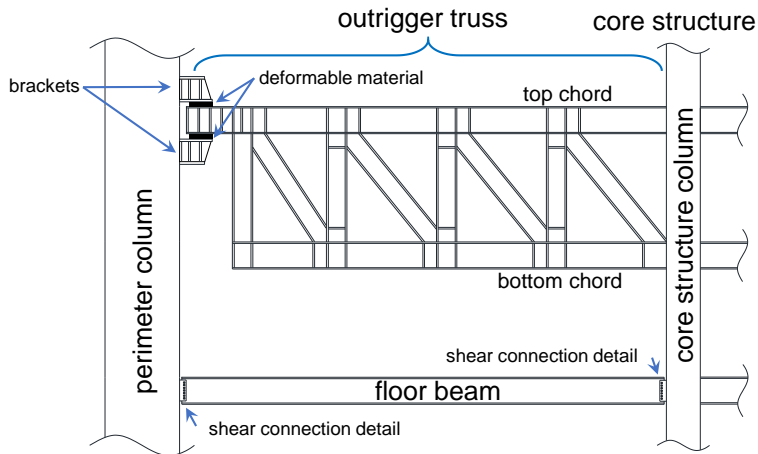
Illustration of conventional outrigger with stoppers detail at outrigger end
